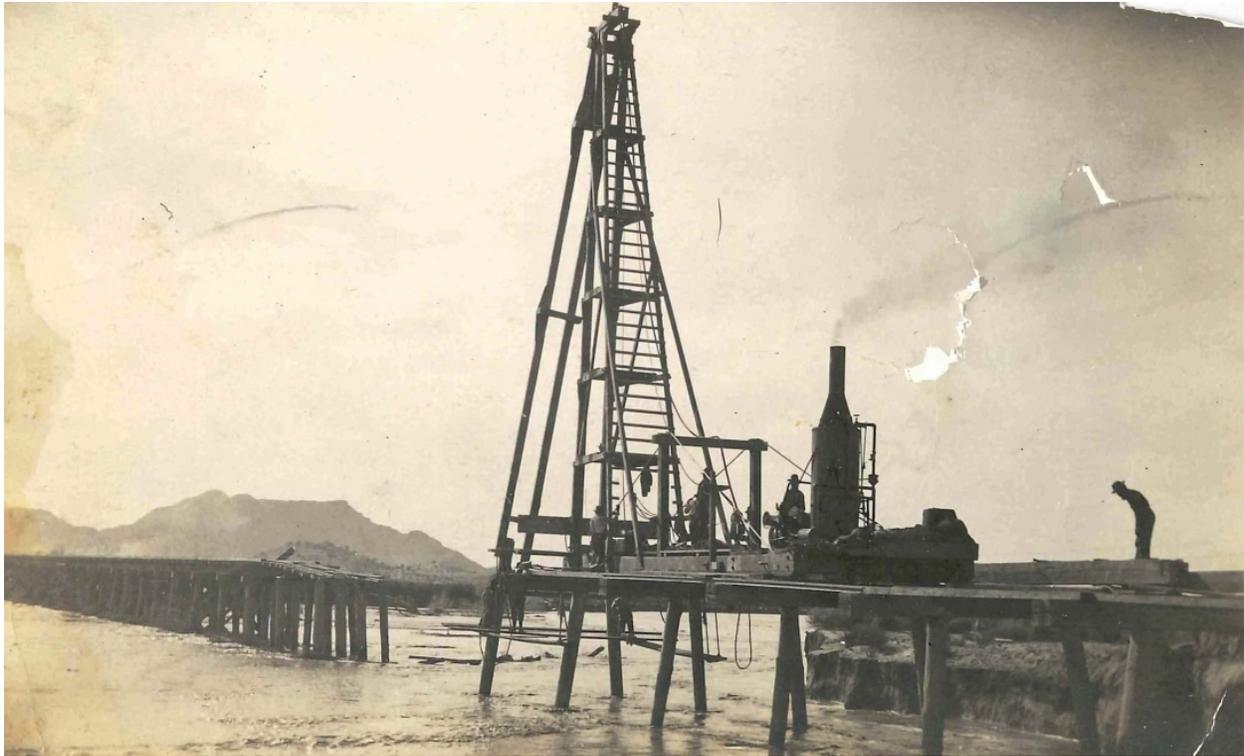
Workers driving pilings to repair the railroad bridge damaged in 1905 by the Gila River flood. Source: Arizona Historical Society, Tucson, Arizona.
